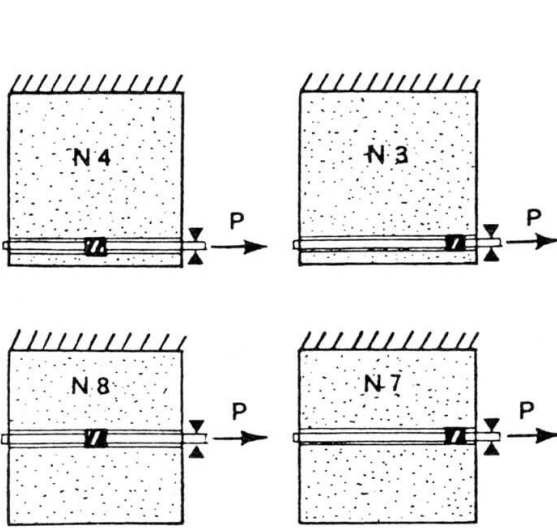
a - Longitudinal cross-sections of the test specimens to show the position of the bar
